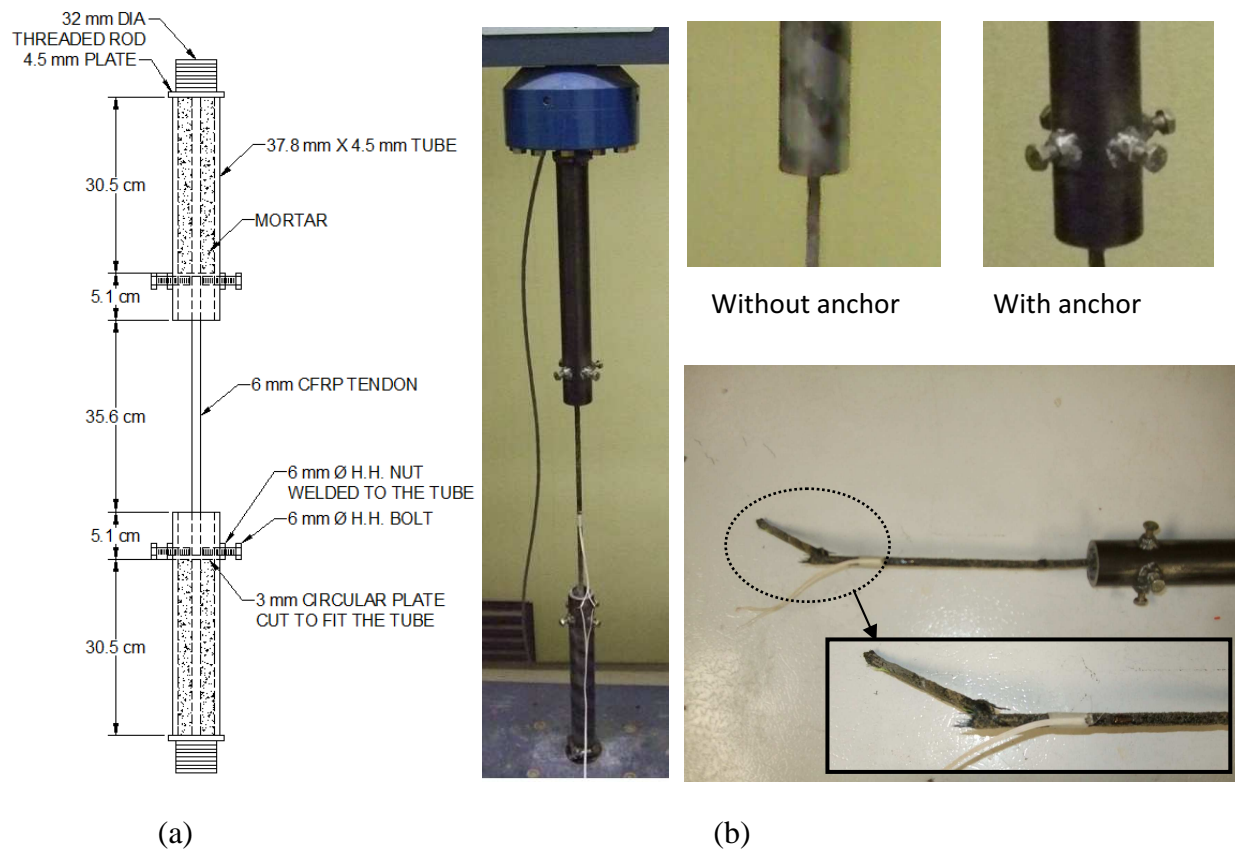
Tension test for anchorage: (a) specimen dimension; (b) test details
